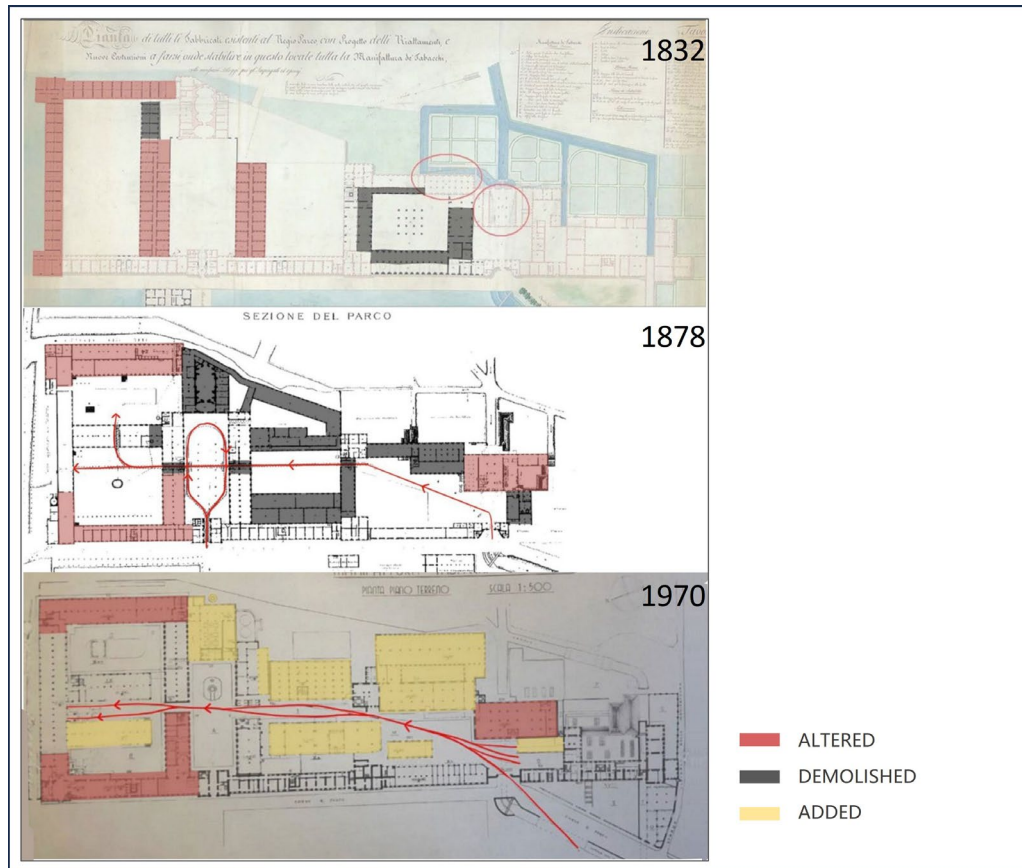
Tobacco Factory Building Plan Evolution Diagram
